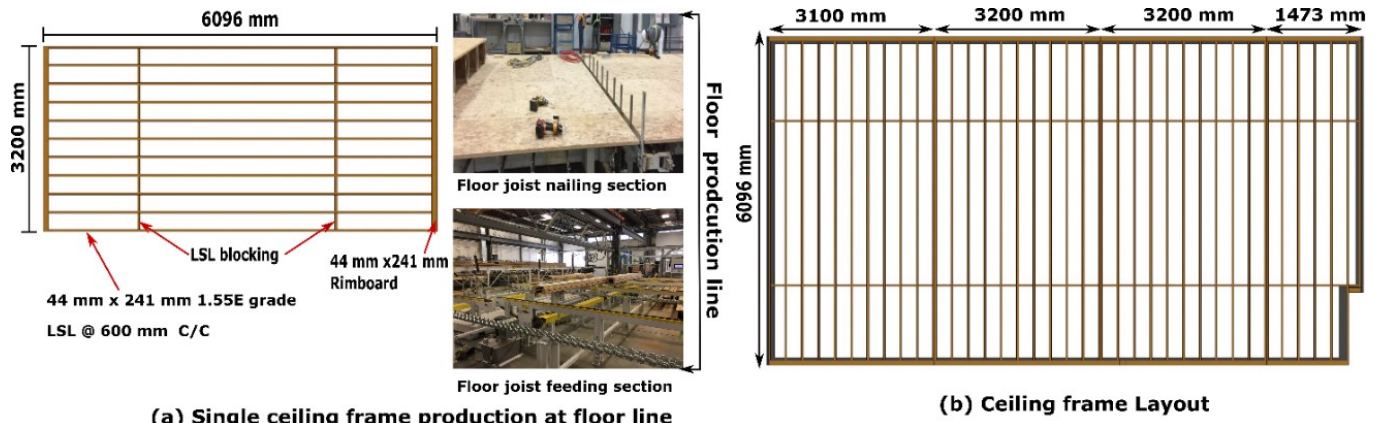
a) Ceiling frame fabrication in Floor Line; b) Ceiling frame layout of the case study
